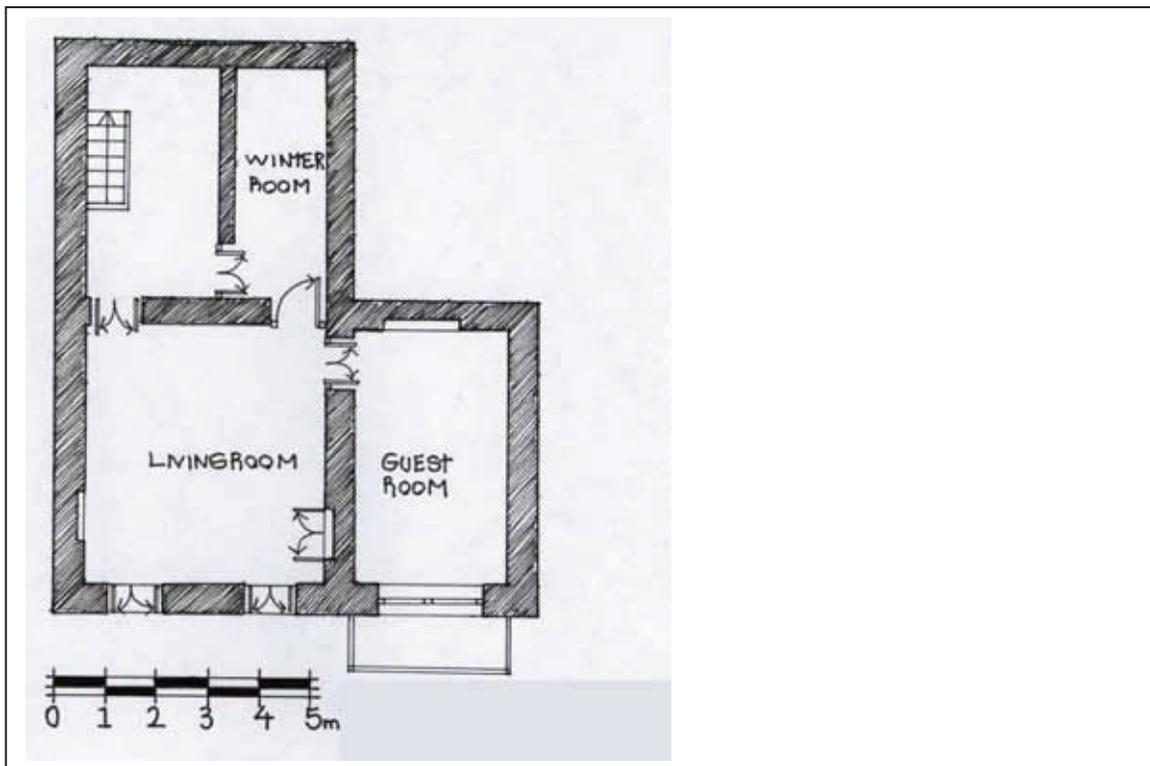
First floor plan of Ibrahim Hashimi Khah's house. Drawing by author, 2013.
